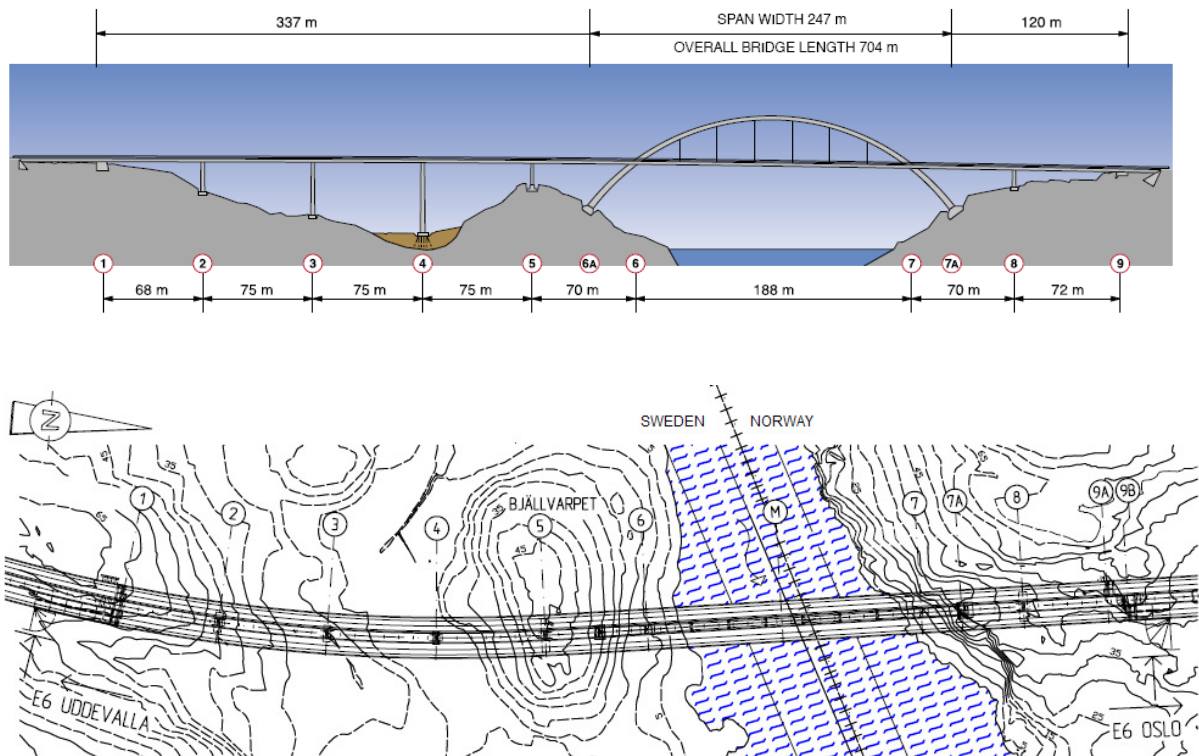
Drawings showing the New Svinesund Bridge in elevation and in plan. Vägverket (2007)
